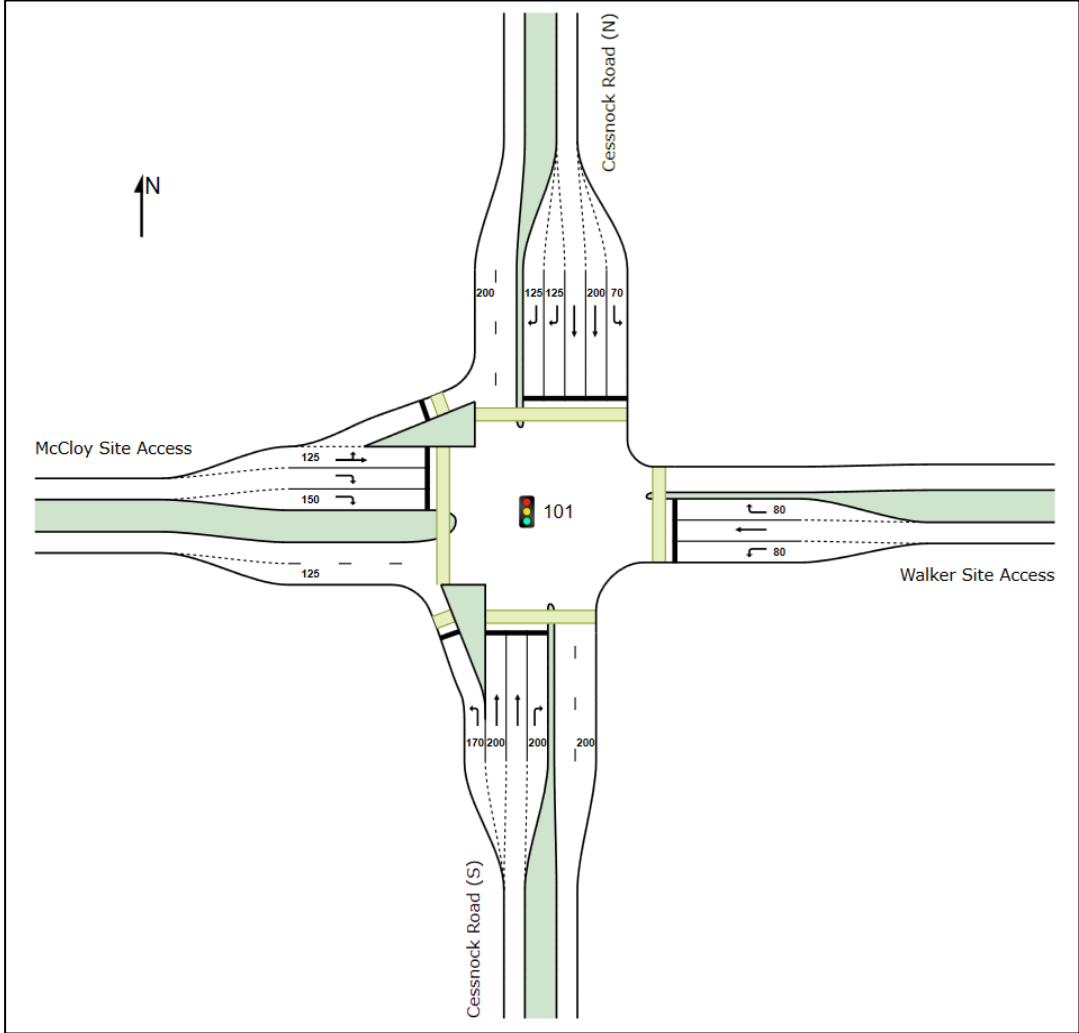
Proposed ultimate layout for new 4-way intersection at Cessnock Road / Walker / McCloy development site
